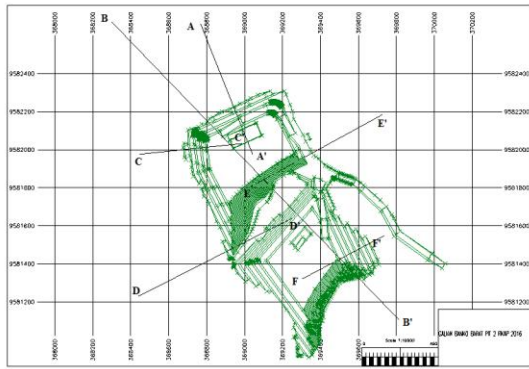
Mining Plan Map of Banko Barat Pit 2, Year 2016 (Source: PT Bukit Asam (Persero) Tbk, Mine Planning Department)
